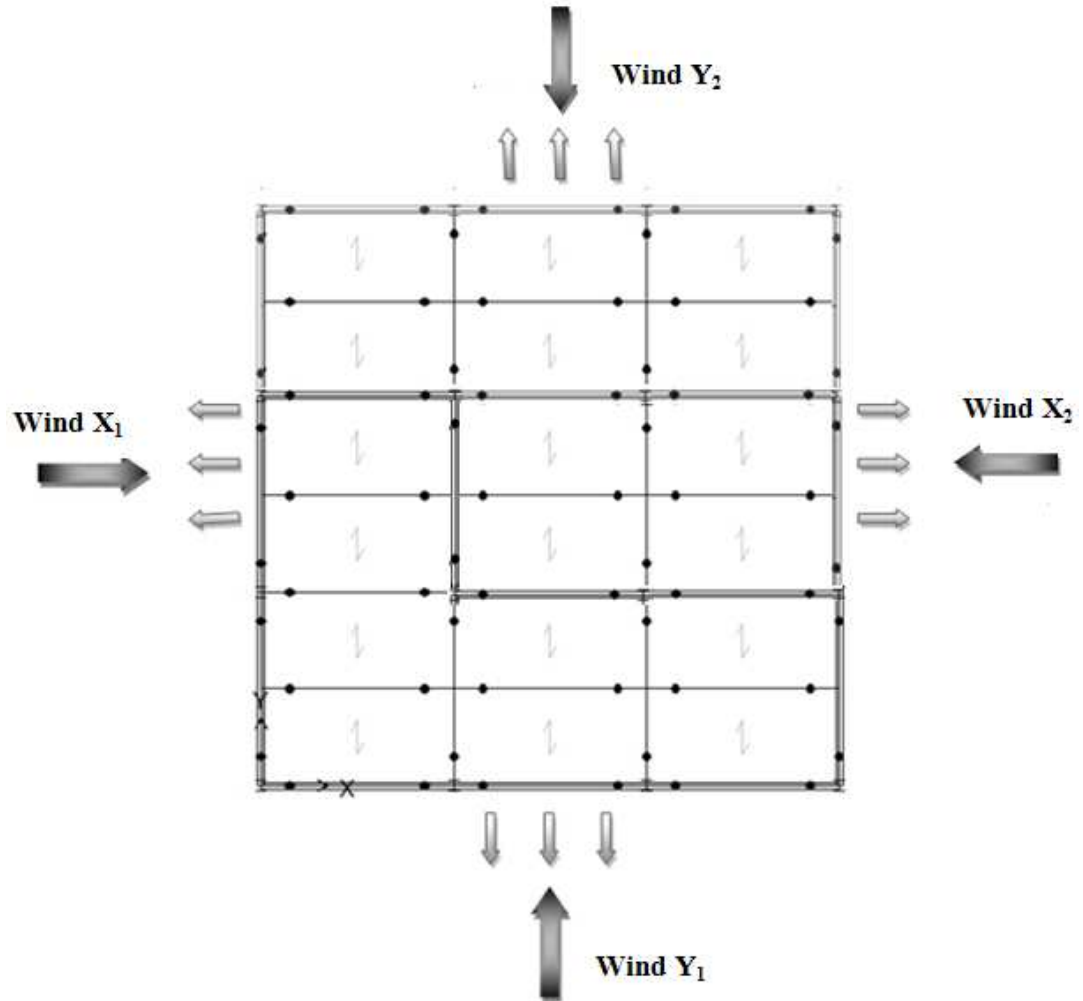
Simple frames with pinned connections and direction of winds (top view plan) for symmetrical plan and asymmetrical section.
